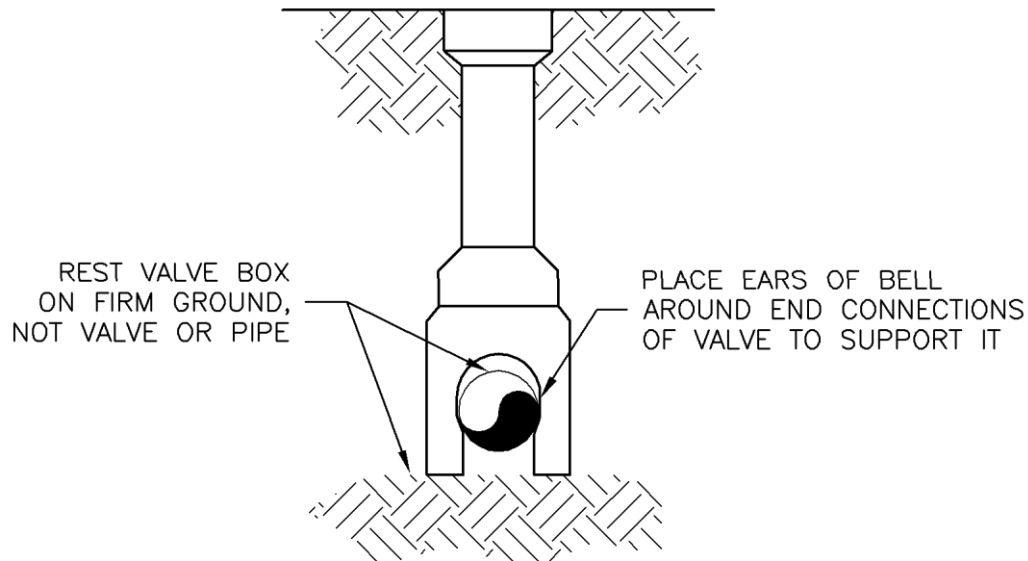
Valve Installation Details to Reduce Shear on Plastic Pipe
